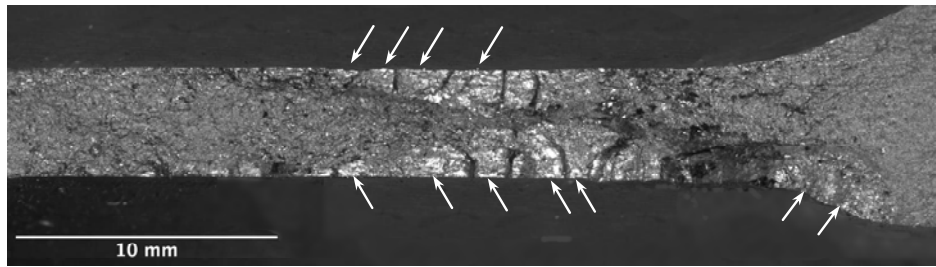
Fracture surface of the broken-open fatigue cracked area in the RHS web taper from an ex-service CB tested until cracking was detected. Some of the exposed fatigue cracks are marked.
